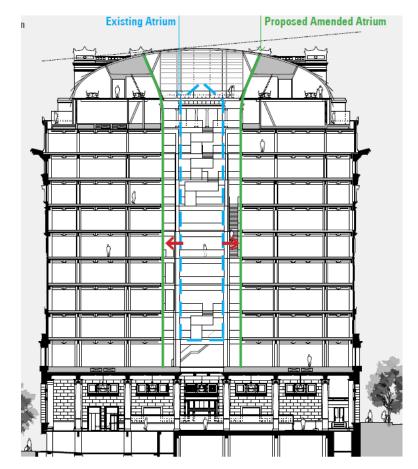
East-west section (existing 6m wide atrium shown in blue; proposed 10.5m wide atrium shown in green)
